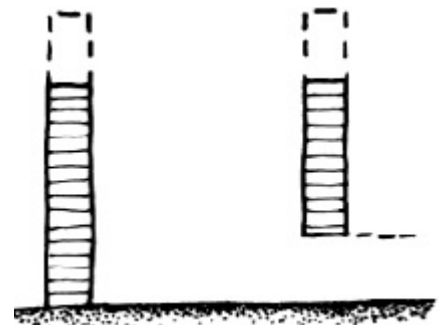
Elevation sketch of furnace #7, by D. Hein.
